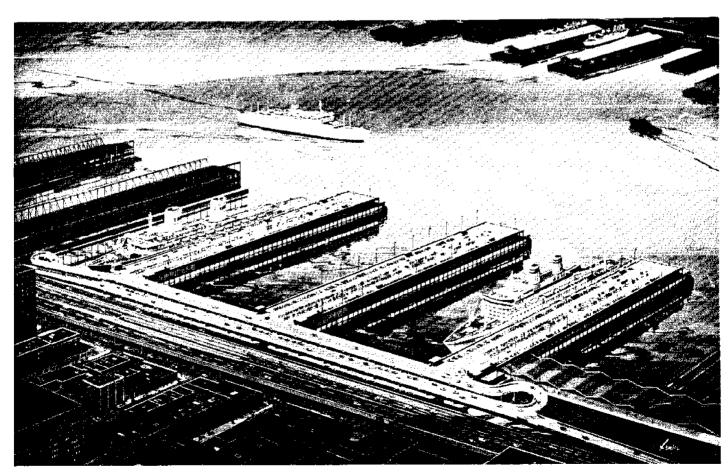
Consolidated Passenger Ship Terminal, Manhattan (Courtesy of Port Authority of New York and New Jersey)
